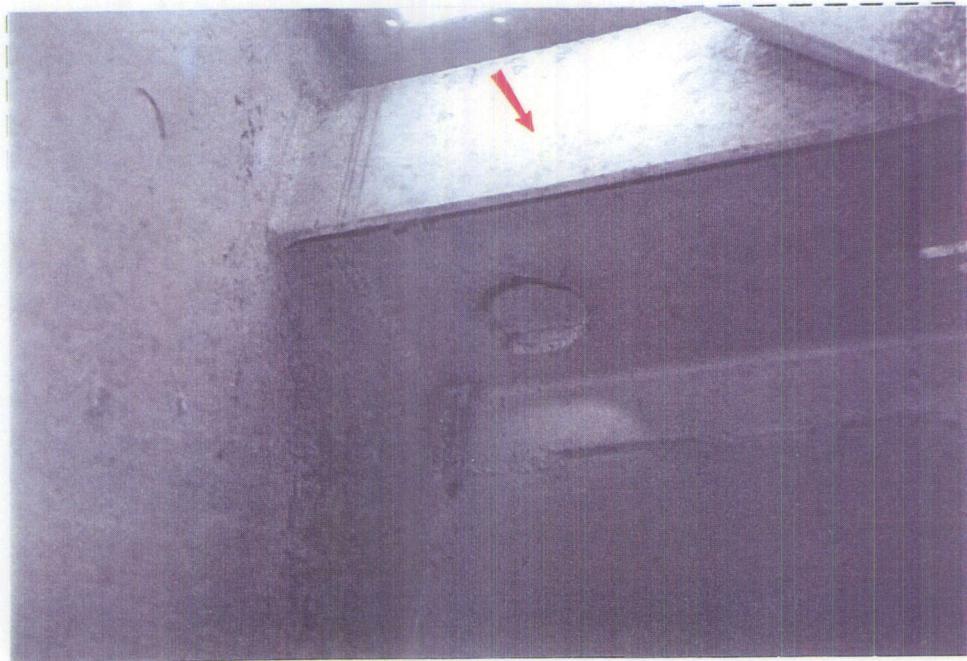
Morris Dam - 70' x 18' Drum Gate #2 - Left side of gate, cantilevered segment. Portion of horizontal u/s faceplate beam (W12x31.8) Note drain hole in corner. - (9/10/98).
